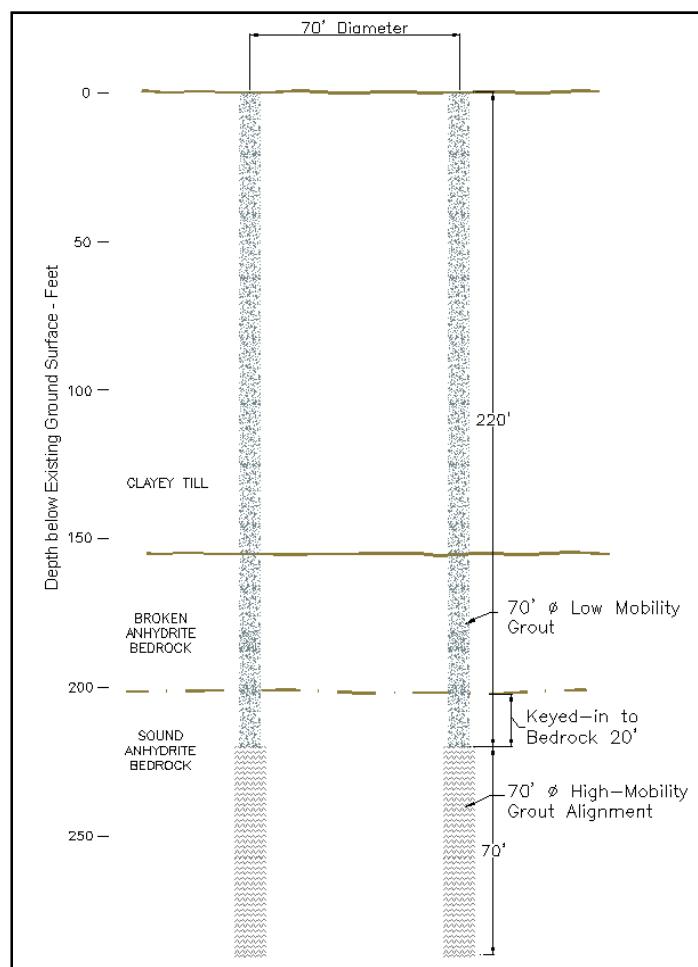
Section View of Grout Perimeter illustrating Grout Treatment Plan
